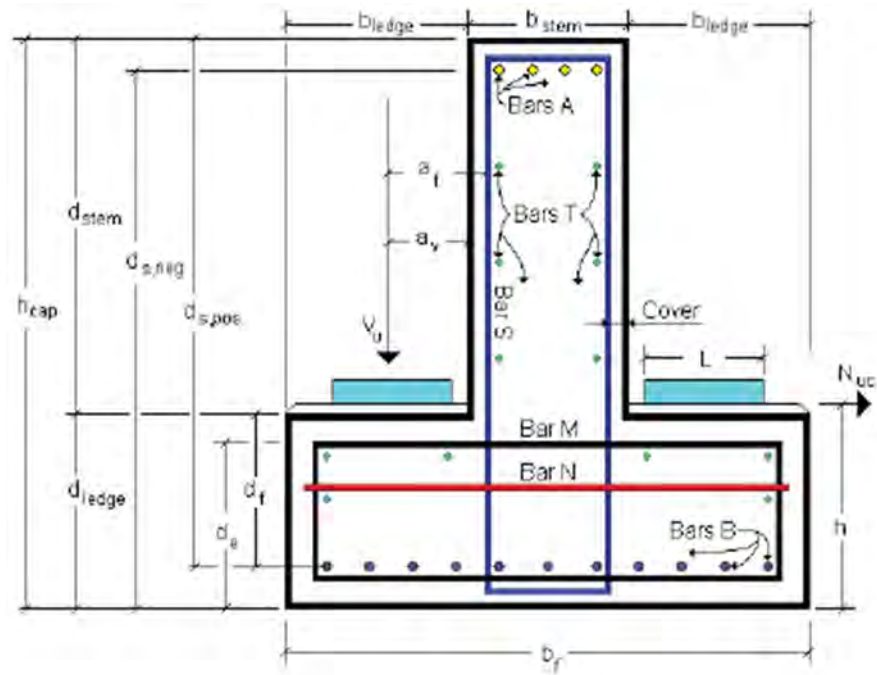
Section View of 45 Degrees Skewed ITBC
